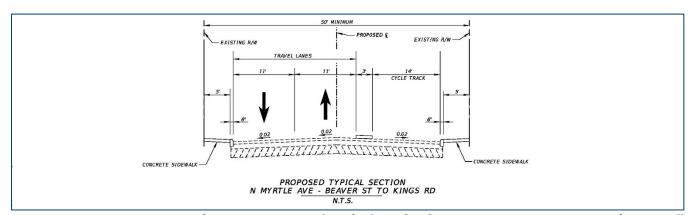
Proposed Typical Section (Segment 2, Beaver Street to Kings Road)
